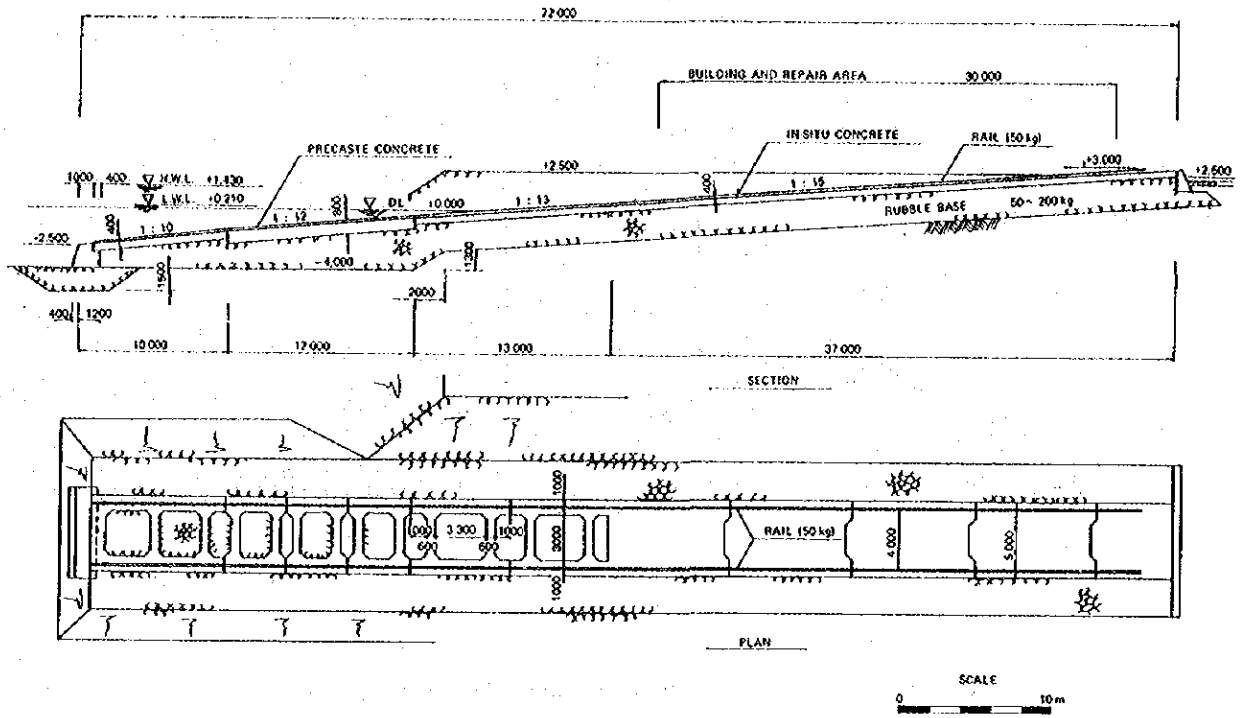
Cross Section of Dry Dock – Lucena Port
